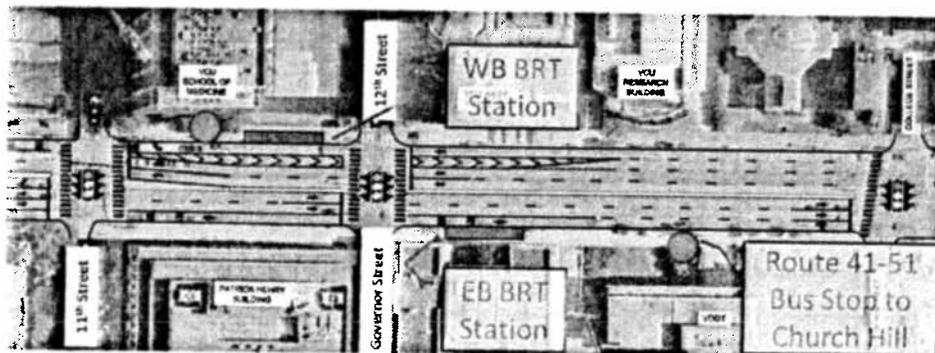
The location of the proposed BRT stations a 12th Street, and existing local bus stops with access to and from Church Hill.
